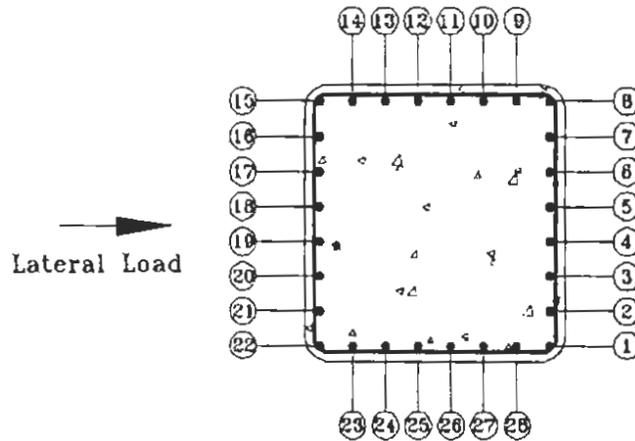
Locations of Column Rebar for Lap Splice Enhancement Rectangular Columns
